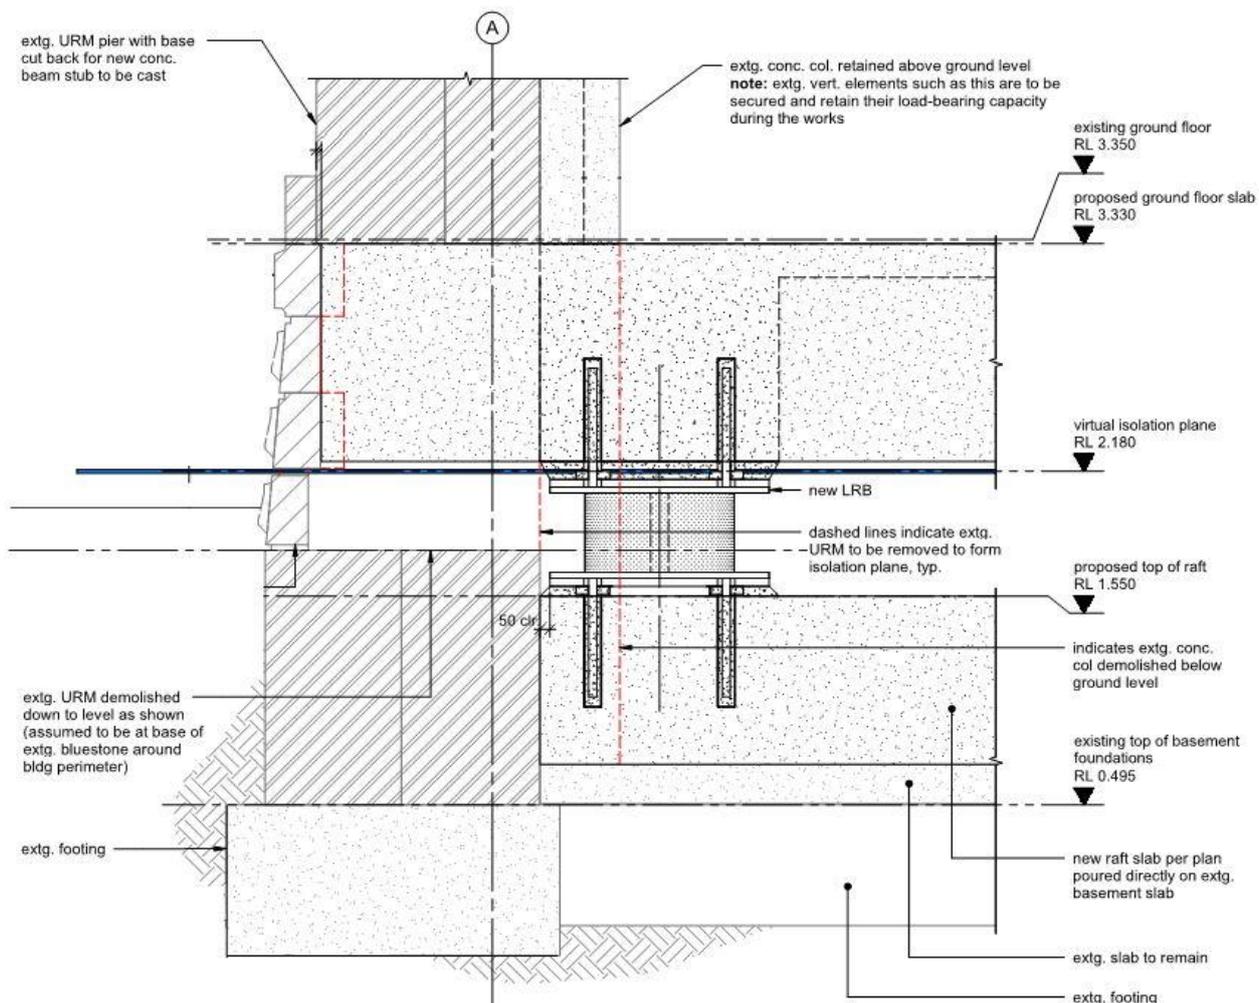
Typical stub beam cantilevering off LRB to pick up URM pier
